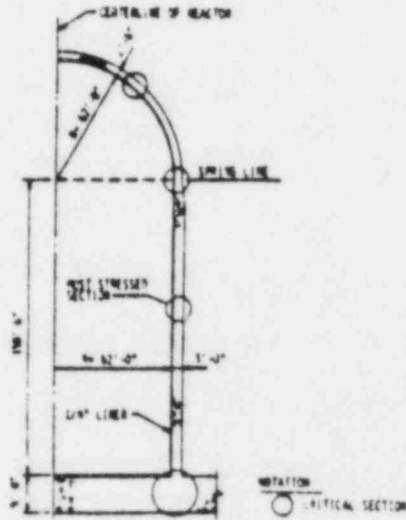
BWR Mark III Reinforced Concrete Containment
